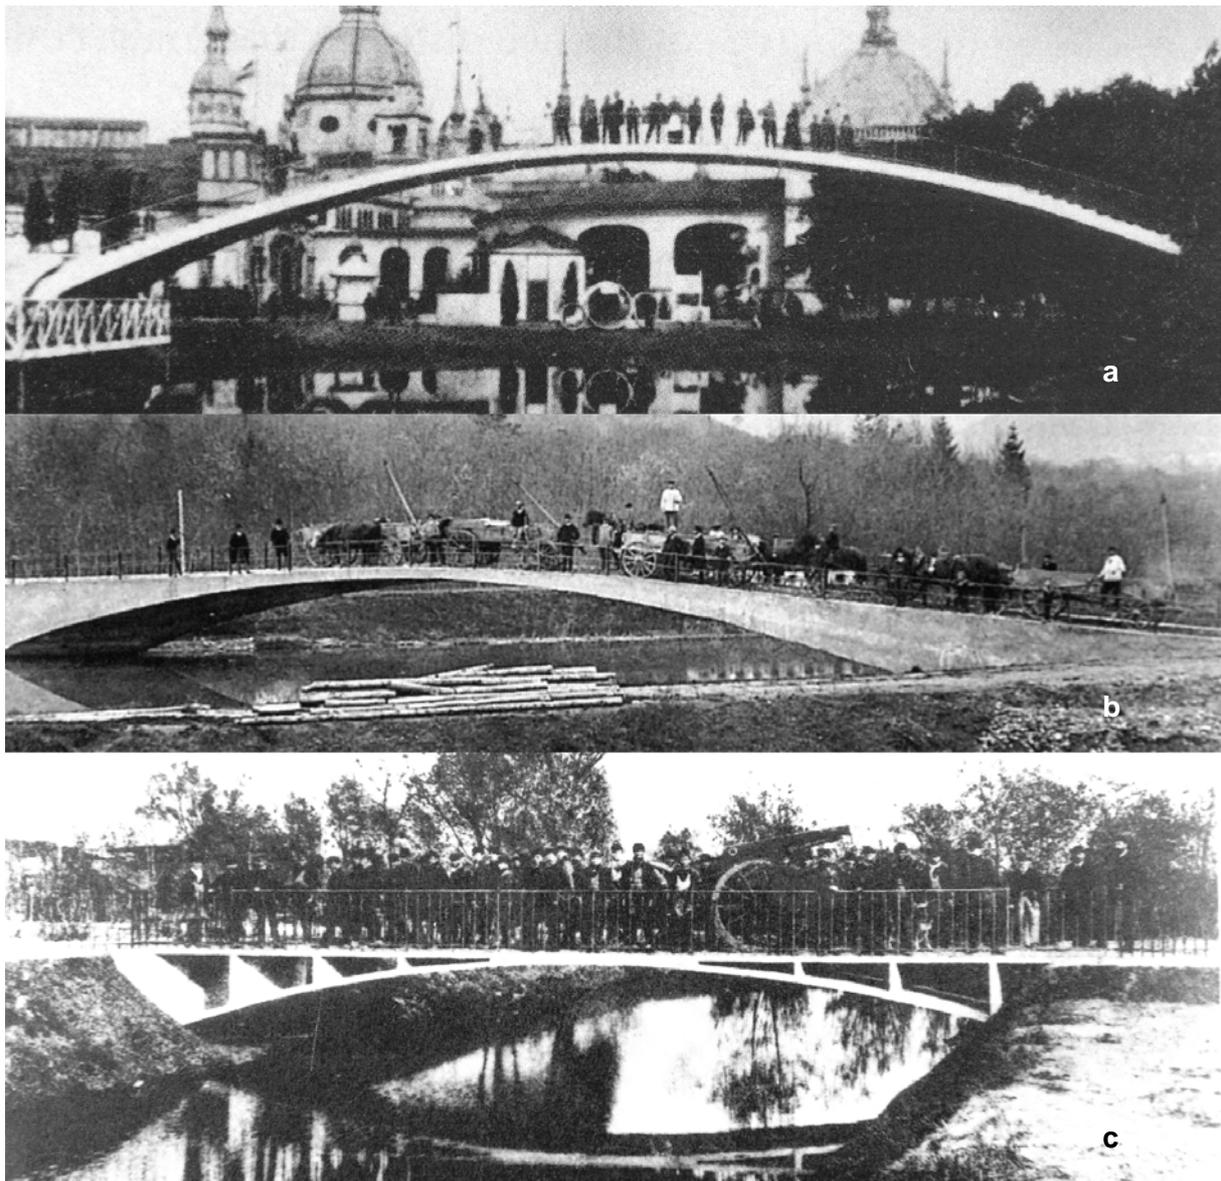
Three reinforced concrete bridges with thin arches, built by Wayss & Freytag with adapted Monier system. (a) Bremen, Germany: 40 m span, 25 cm thick at center; with Matthias Koenen, 1890. (b) Wildeggen, Switzerland: 37 m span, 3.5 m rise, 45° skew, 20 cm thick at crown; 1890. (c) Location unknown: 37.2 m; 1890. (Wittfoht, (a); Bosc, (b); Sutherland, (c))
